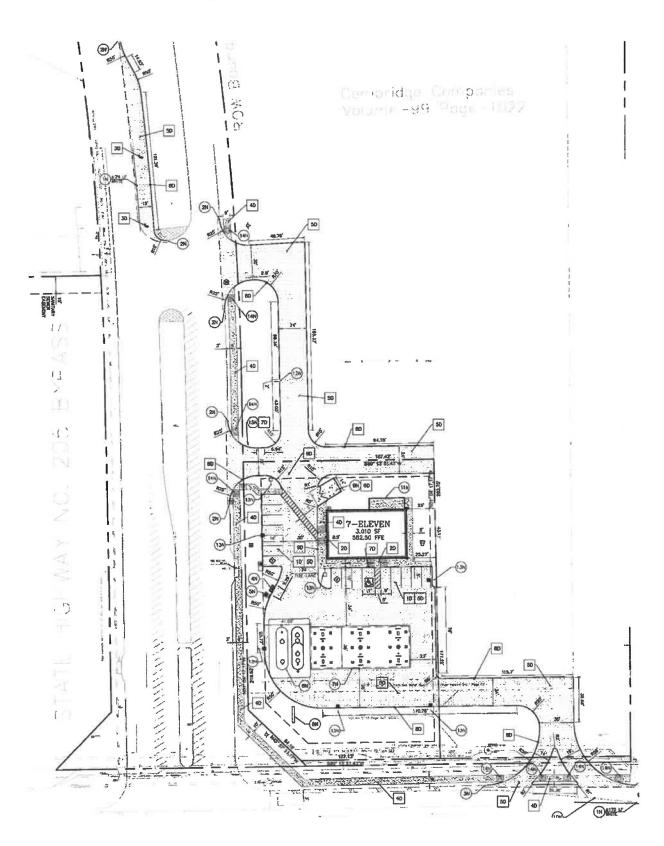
EXHIBIT 'G':Concept Plan and Elevations from Ordinance No. 12-13
